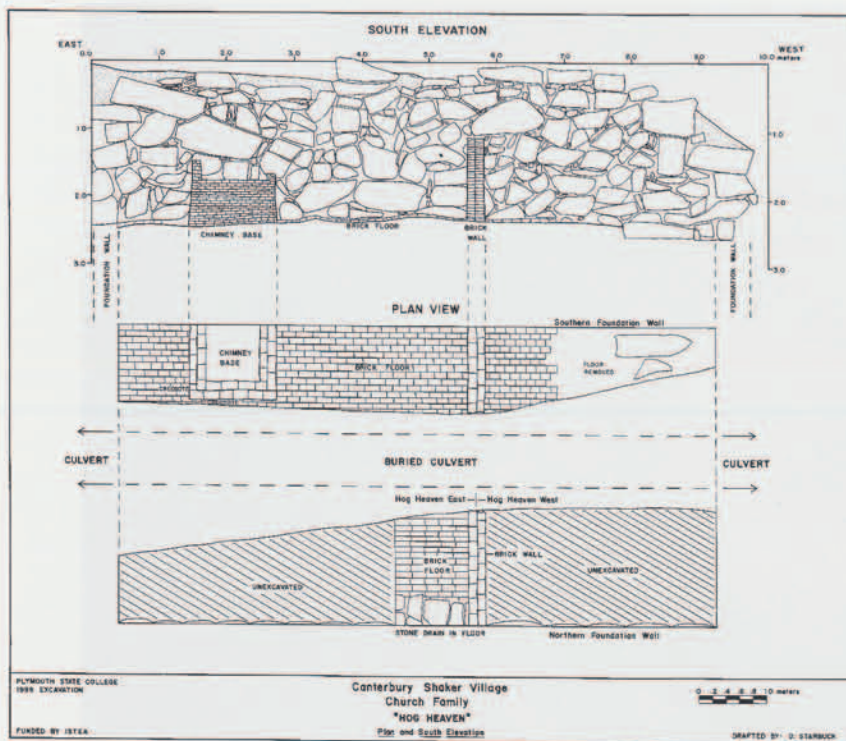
PLAN AND SOUTH ELEVATION OF HOG HEAVEN.
